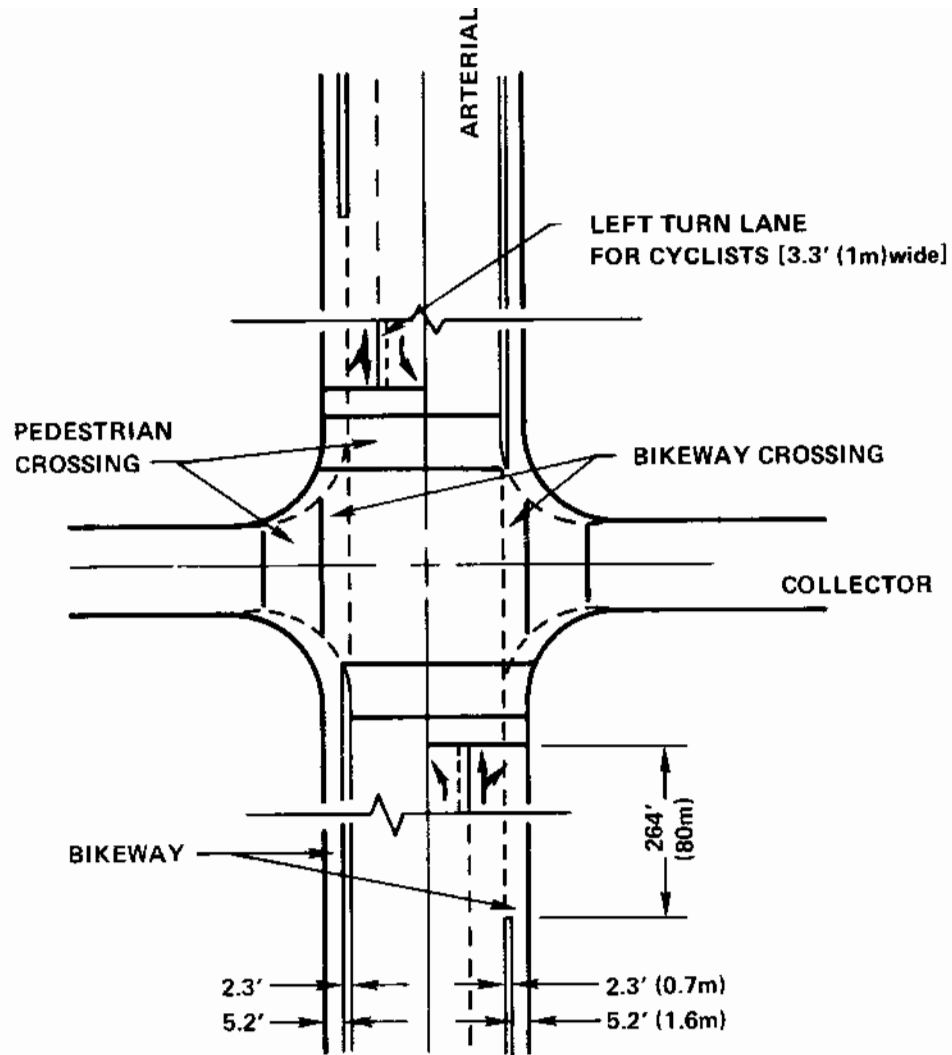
Recommended German Intersection Design with Bikeway on an Arterial Street Having Heavy Turning Movements onto the Collector Street. (Reference 26, p. 21)
